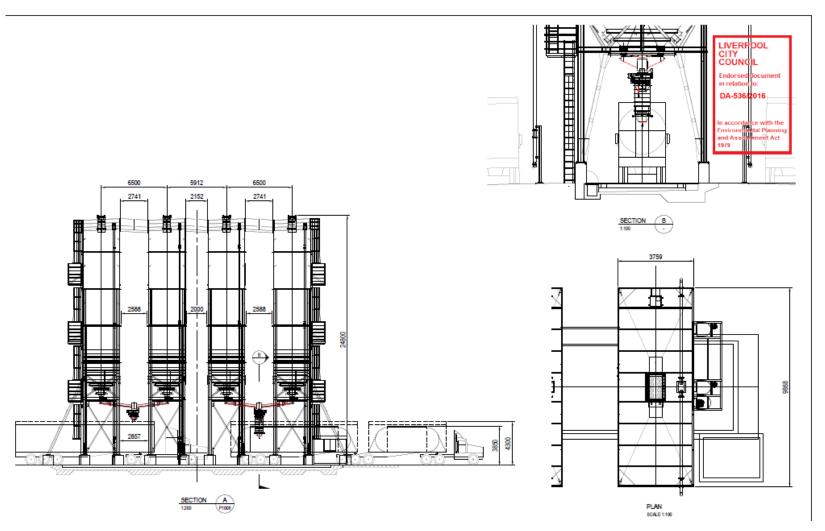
Modification Area 2 – Indicative General Arrangement for Additional 600t Ash Storage Silos (Source: APP Corporation, 2016 – SEE for Similar Reference Site)
